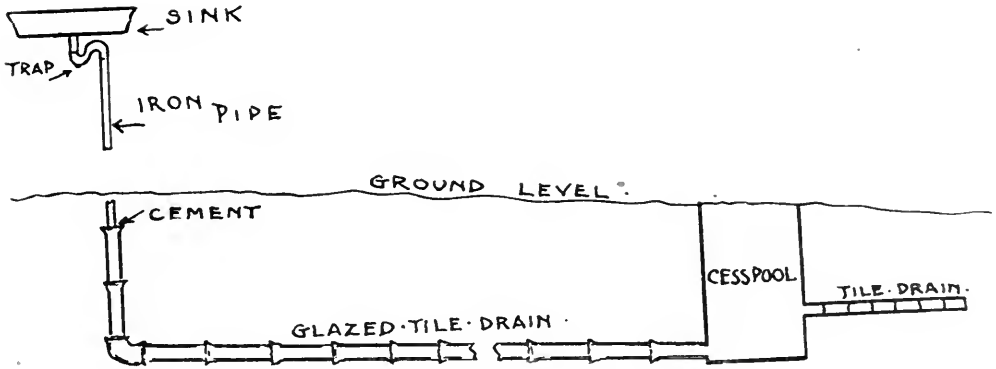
APPROVED PLAN OF KITCHEN DRAINAGE SYSTEM.
